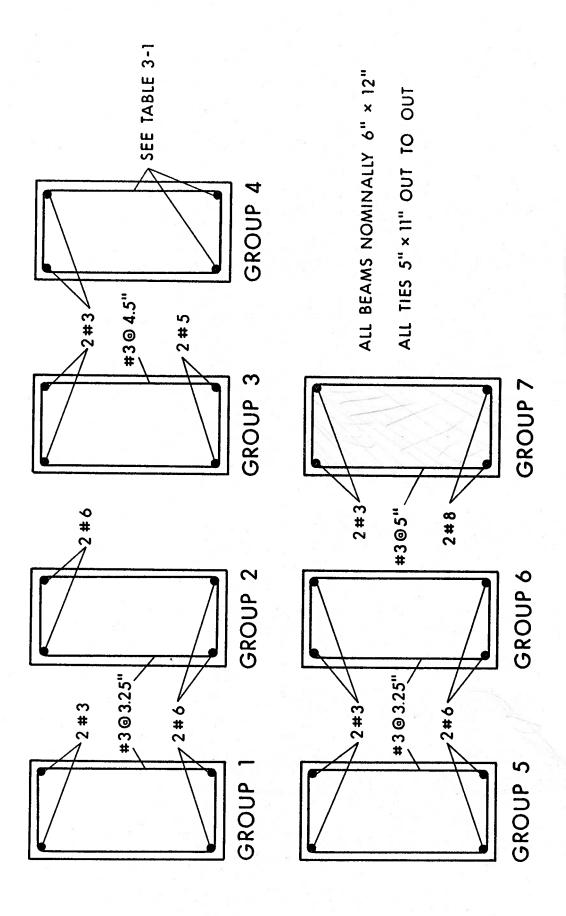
2 REINFORCING STEEL DETAILS
